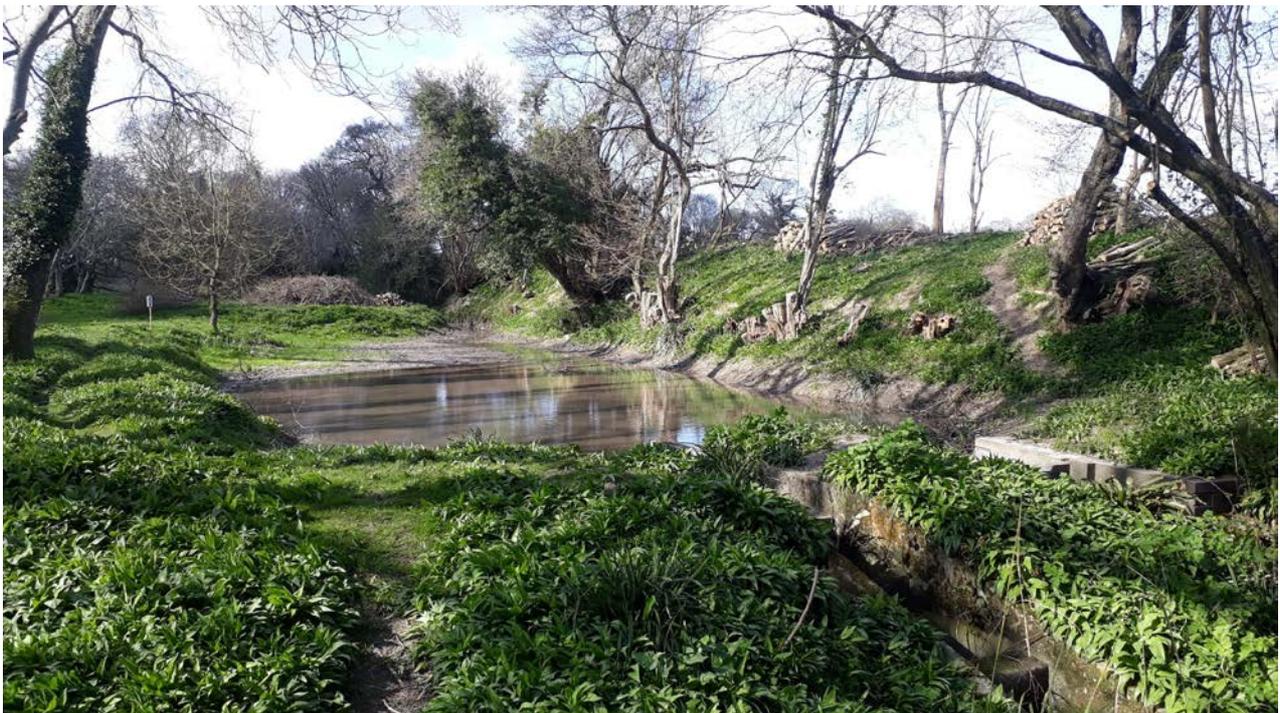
view of the Pill Pond from downstream looking upstream. The concrete fish pass and wooden drop board structure can be seen in the foreground.
